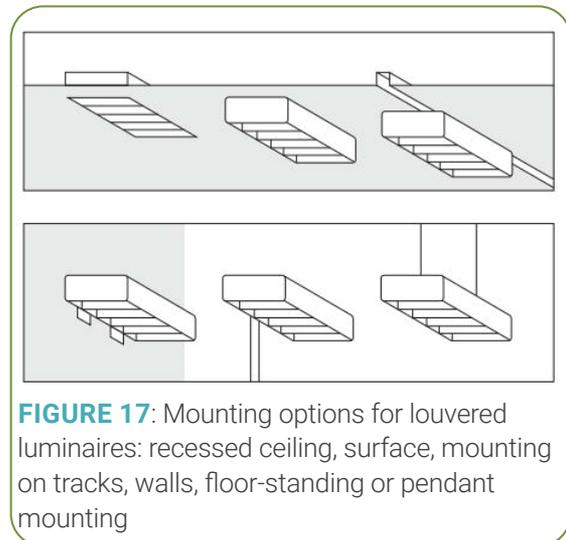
Mounting options for louvered luminaires: recessed ceiling, surface, mounting on tracks, walls, floor-standing or pendant mounting
